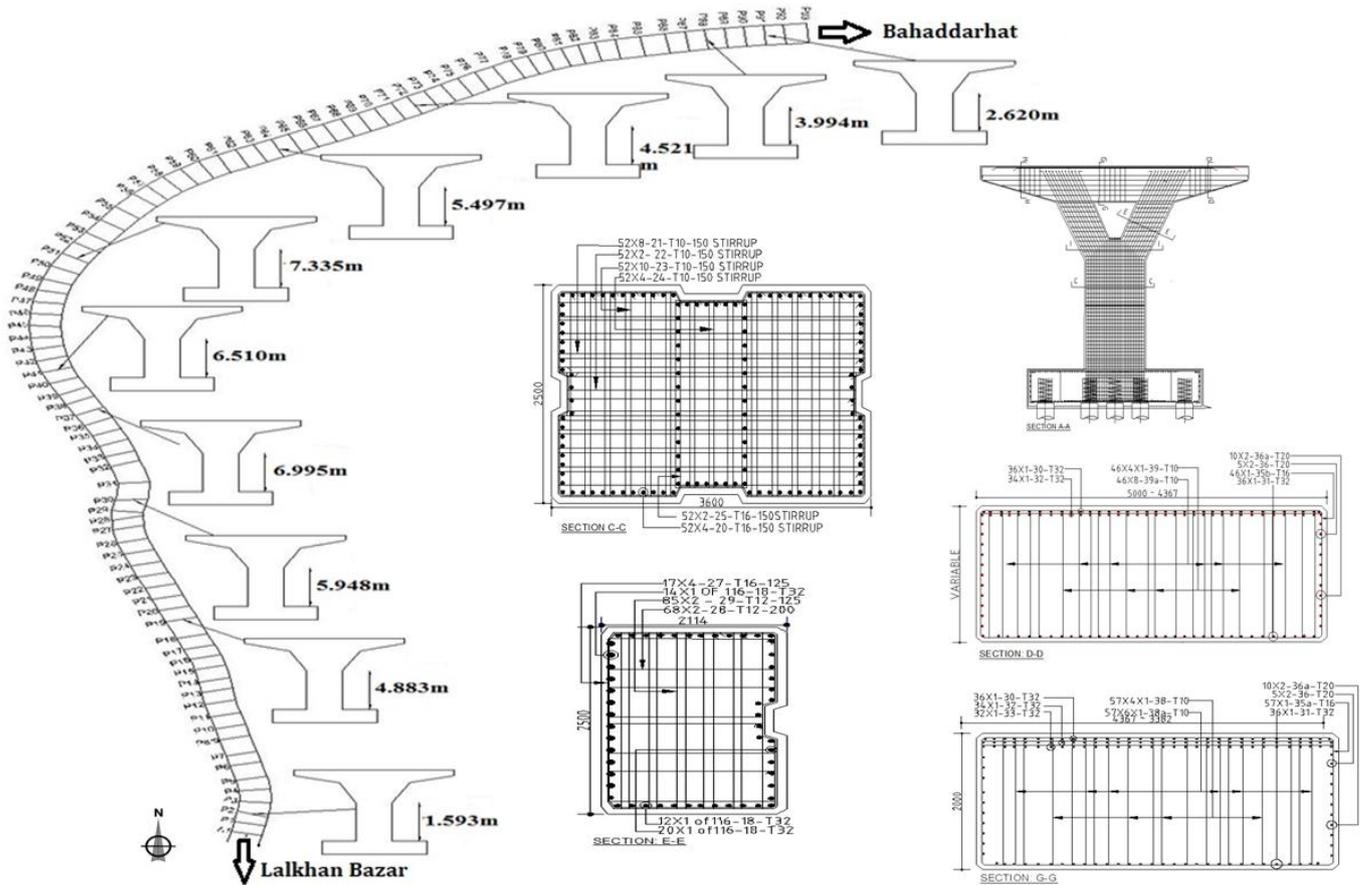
Layout of the flyover and typical cross-sections of components of pier and pier caps.
